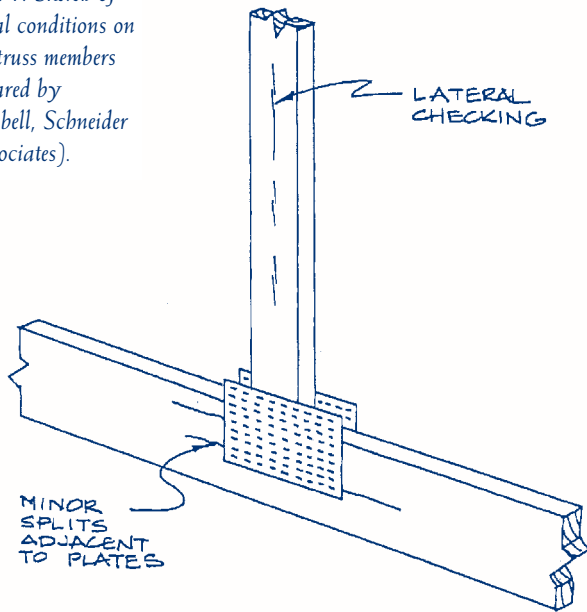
Sketch of typical conditions on substandard truss members (prepared by Campbell, Schneider & Associates).
